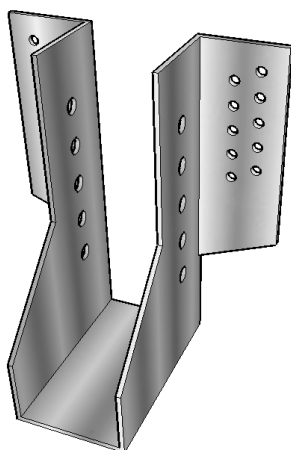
A beam shoe used to connect a timber beam to a wall or a column.
